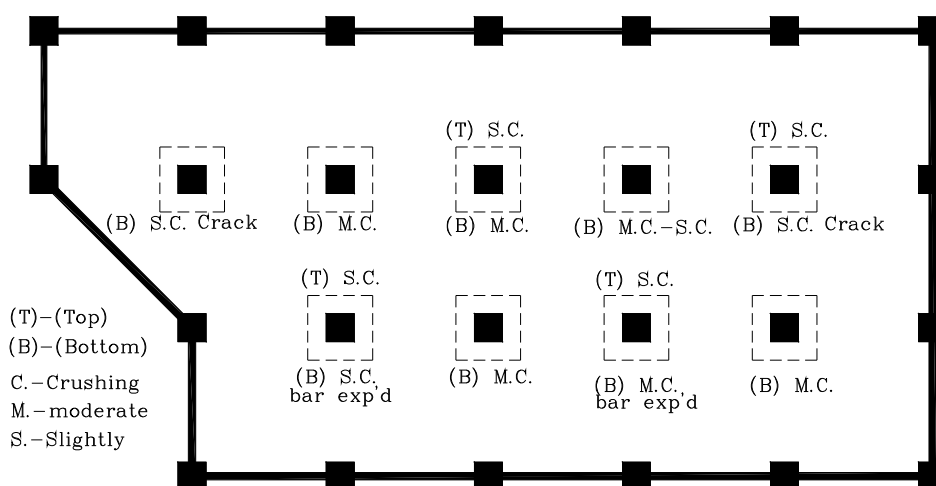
Damage of the slab due to punching shear (Sabol, 1994)
